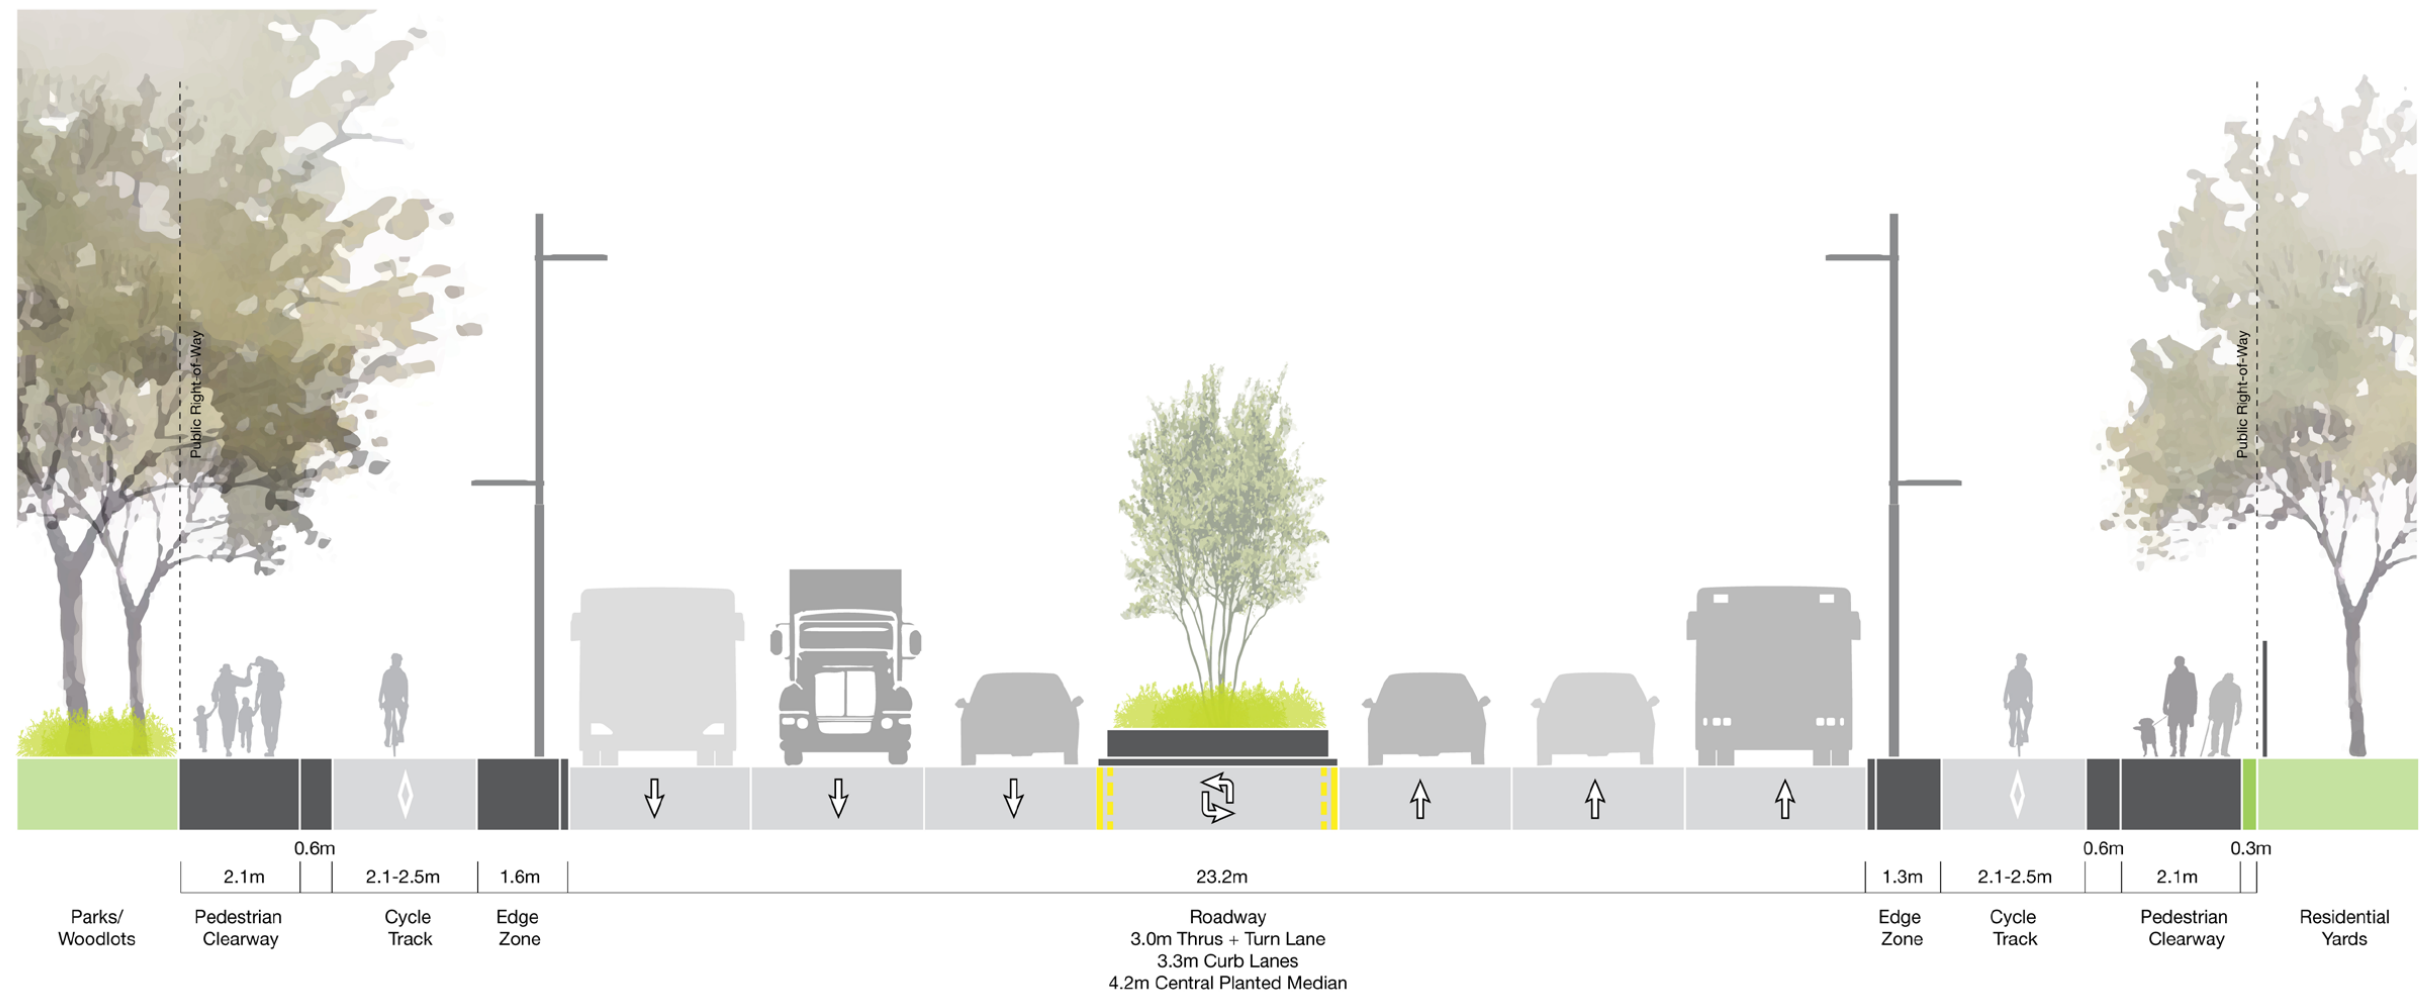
Ellesmere Road Cross Section 36m ROW
